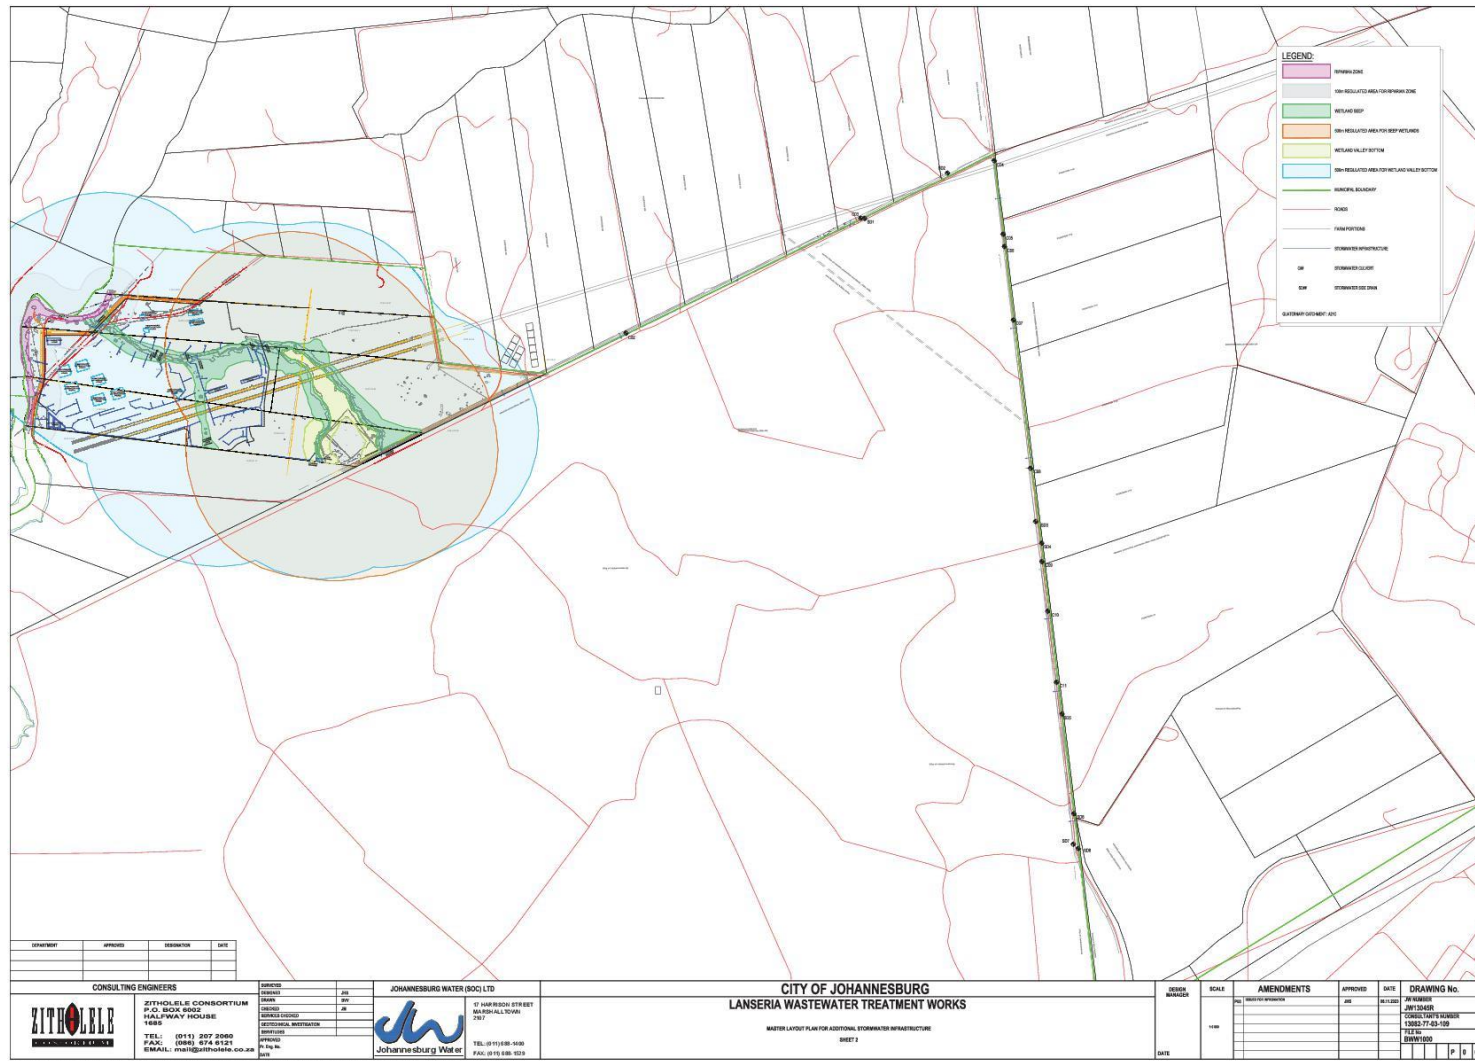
Master Layout Plan (Including stormwater infrastructure along access road to be upgraded)
